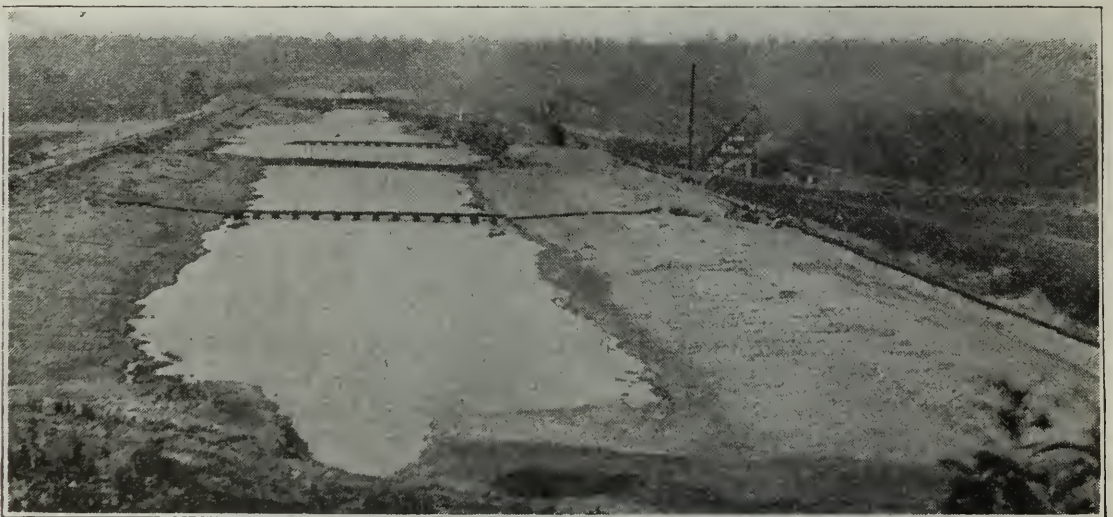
Englewood Dam showing pool on top of Hydraulic Fill.
